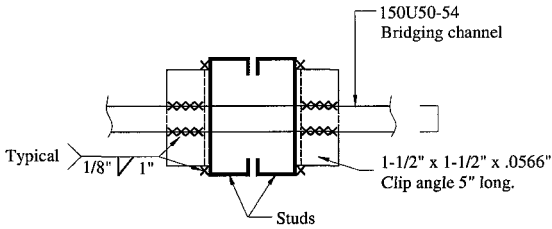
Bridging Clip Angle at Double Stud Anchorage Point
